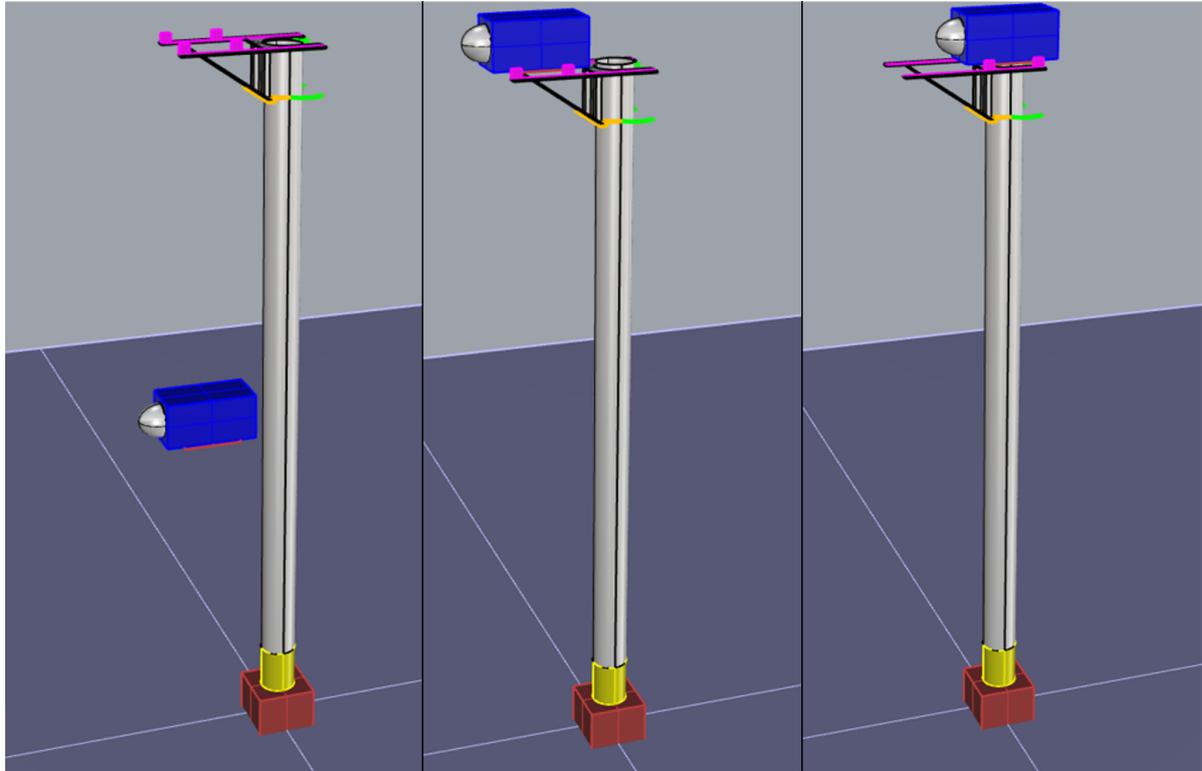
Installation of Nacelle using the elevator platform, Left lifting of nacelle from barge to tower top, Middle nacelle at maximum elevation, Right skidding of nacelle over tower top.
